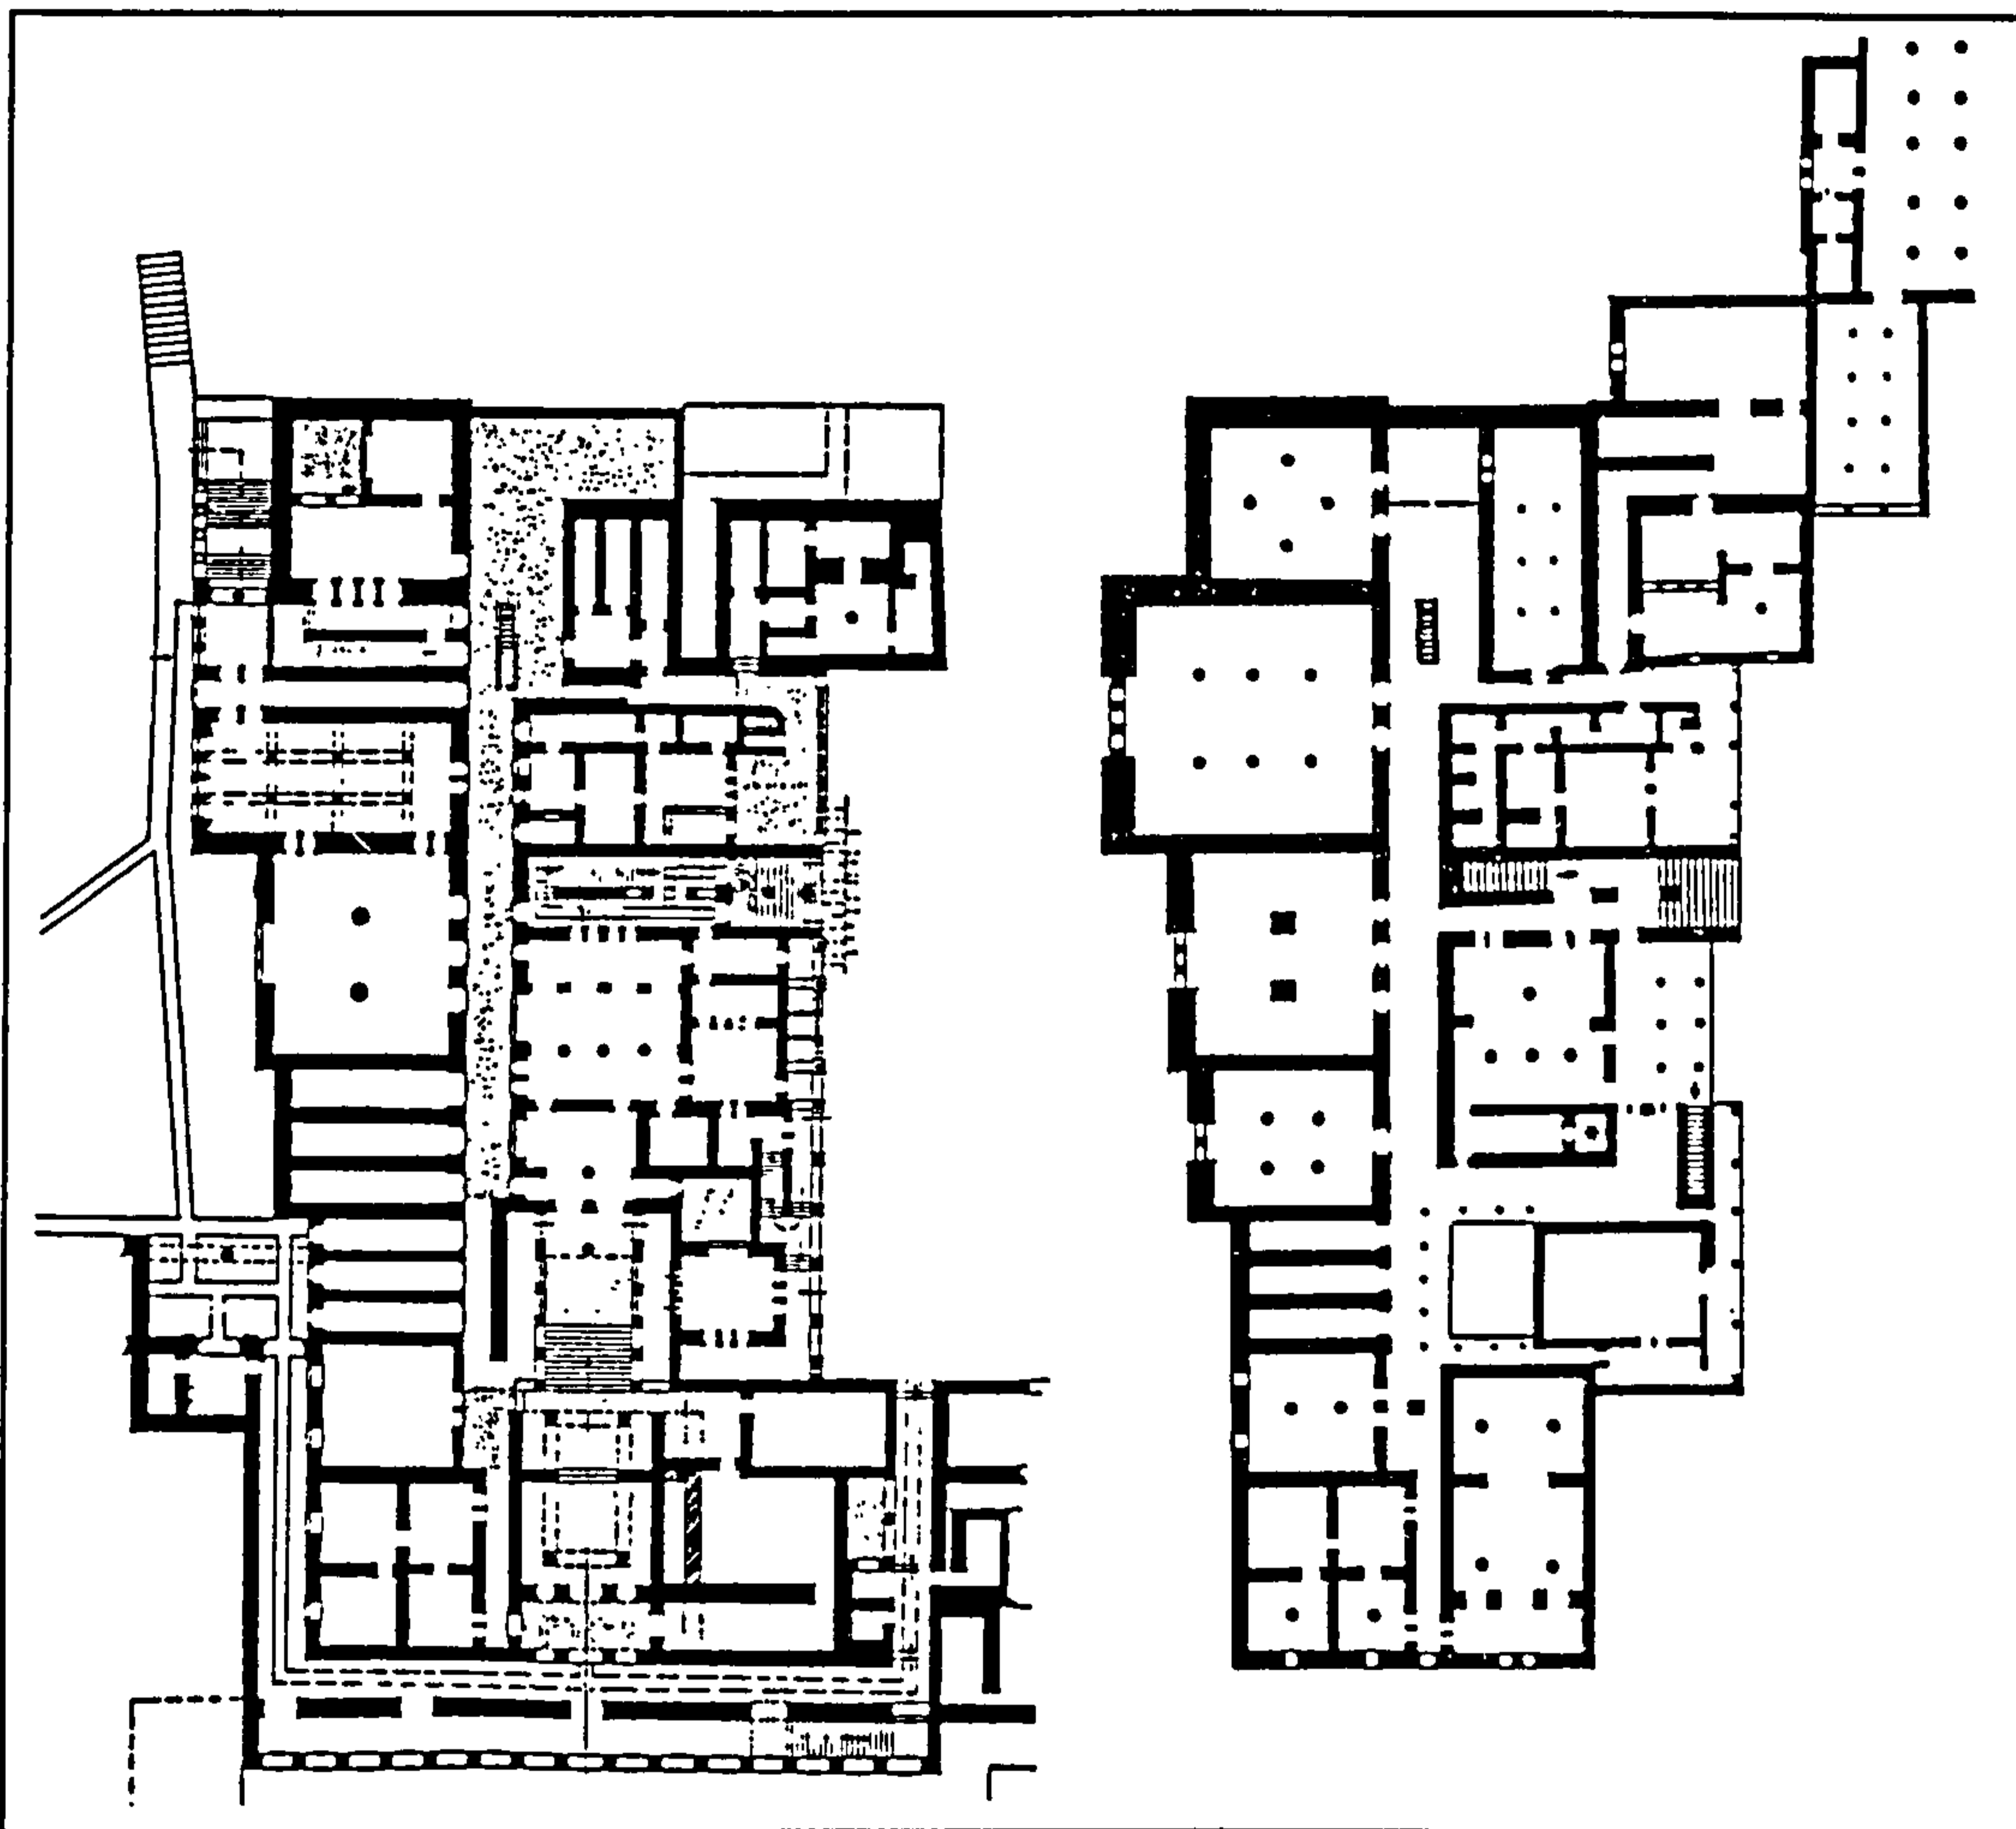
Plan of the reconstructed upper floor. Evans' reconstruction (left) and Castleden's reconstruction (right).
